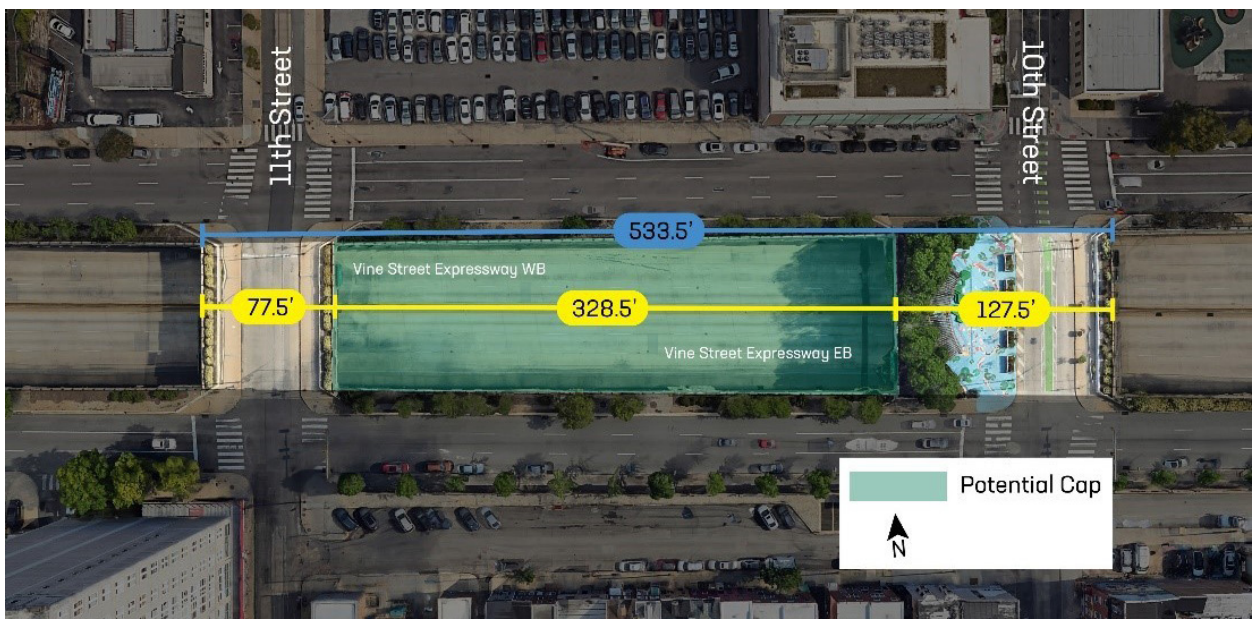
Measurements from 10th Street Bridge to 11th Street Bridge
